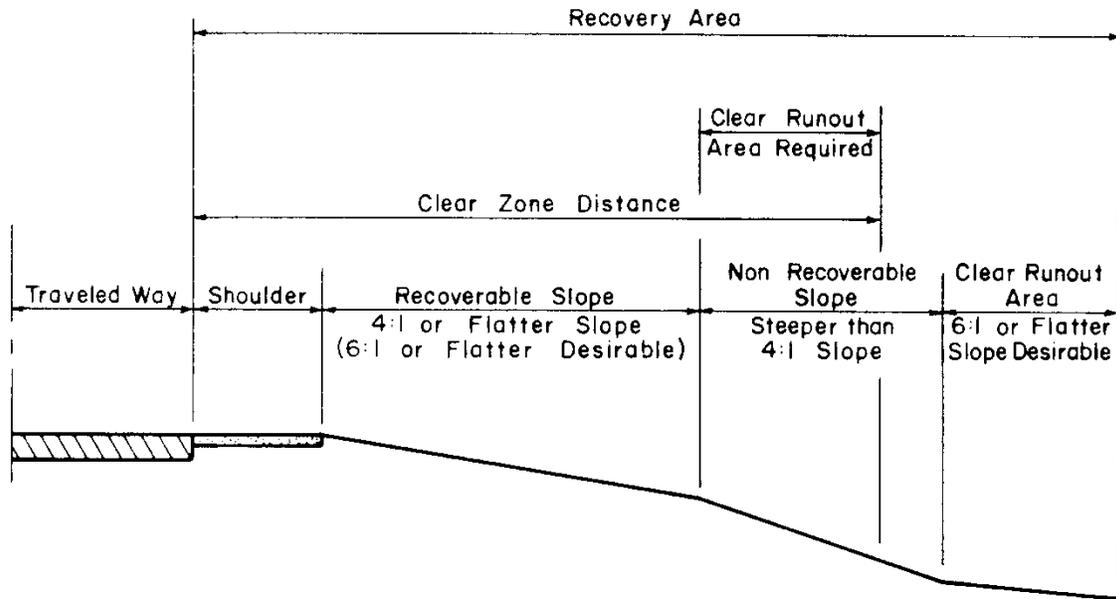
EXAMPLE OF A PARALLEL EMBANKMENT SLOPE DESIGN
